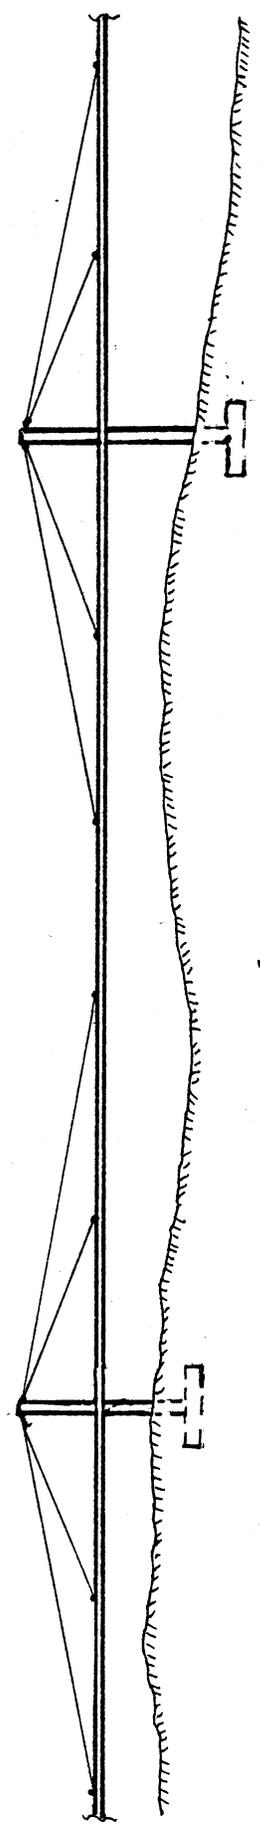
illustrates a cable-stayed, elevated bridge structure intended to span 1,000 feet. Note that in addition to the normal cable stays from above, there are others from below as well. These lower ones, called counter cables, serve to reduce vibrations, which are particularly significant on long spans. Again, as with the previously described structure, the bridge could be built without active controls, but would require much less material with active controls in either the bridge itself or the train bodies. The drawing shows a ground clearance of about 20 feet to the lowest cable; however, in some lower locations (as in the median) no clearance is required and the height of the towers could be reduced accordingly.
